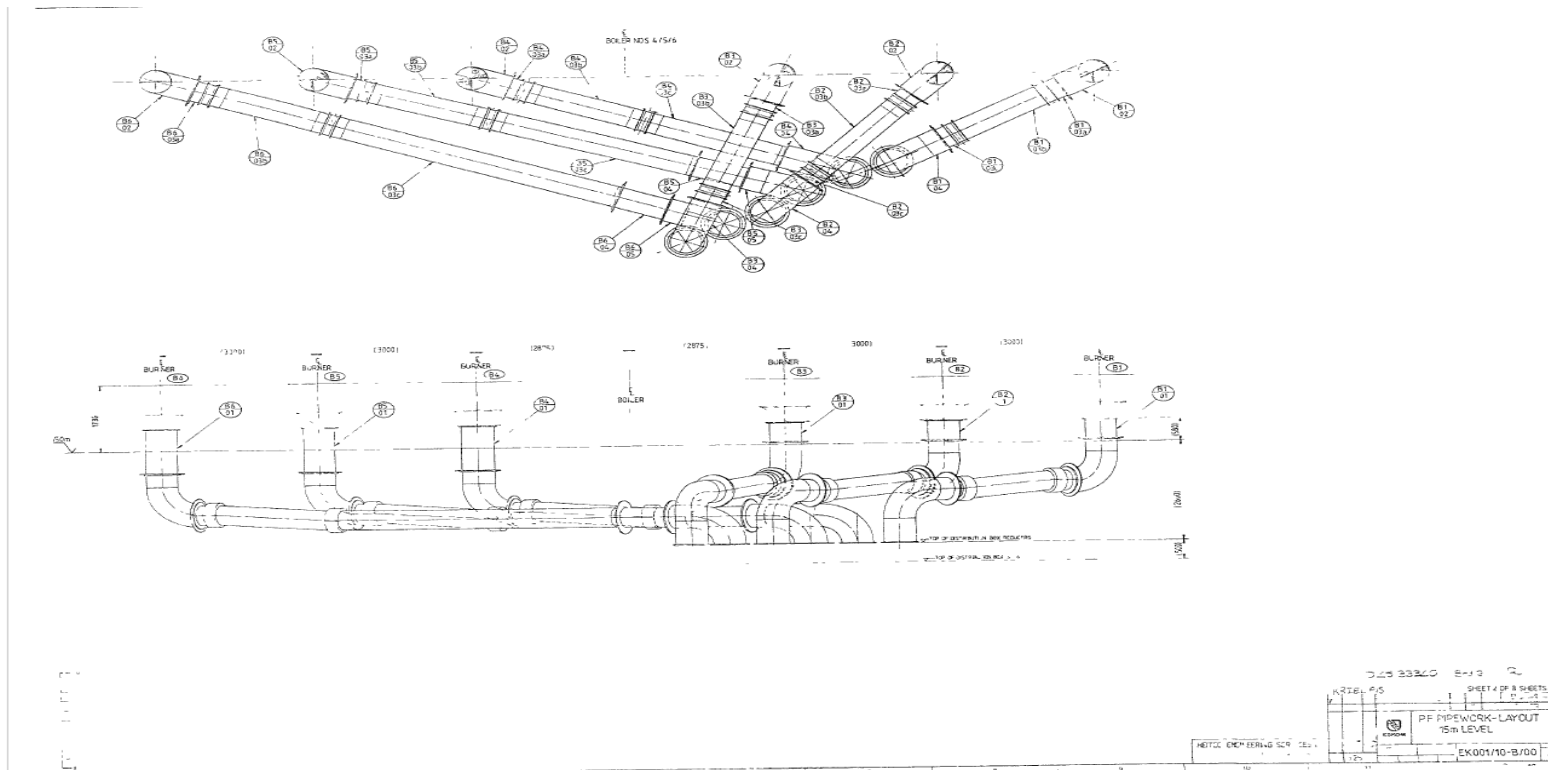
Unit 4-6 Mill B PF pipes arrangements and elevation around the boiler
